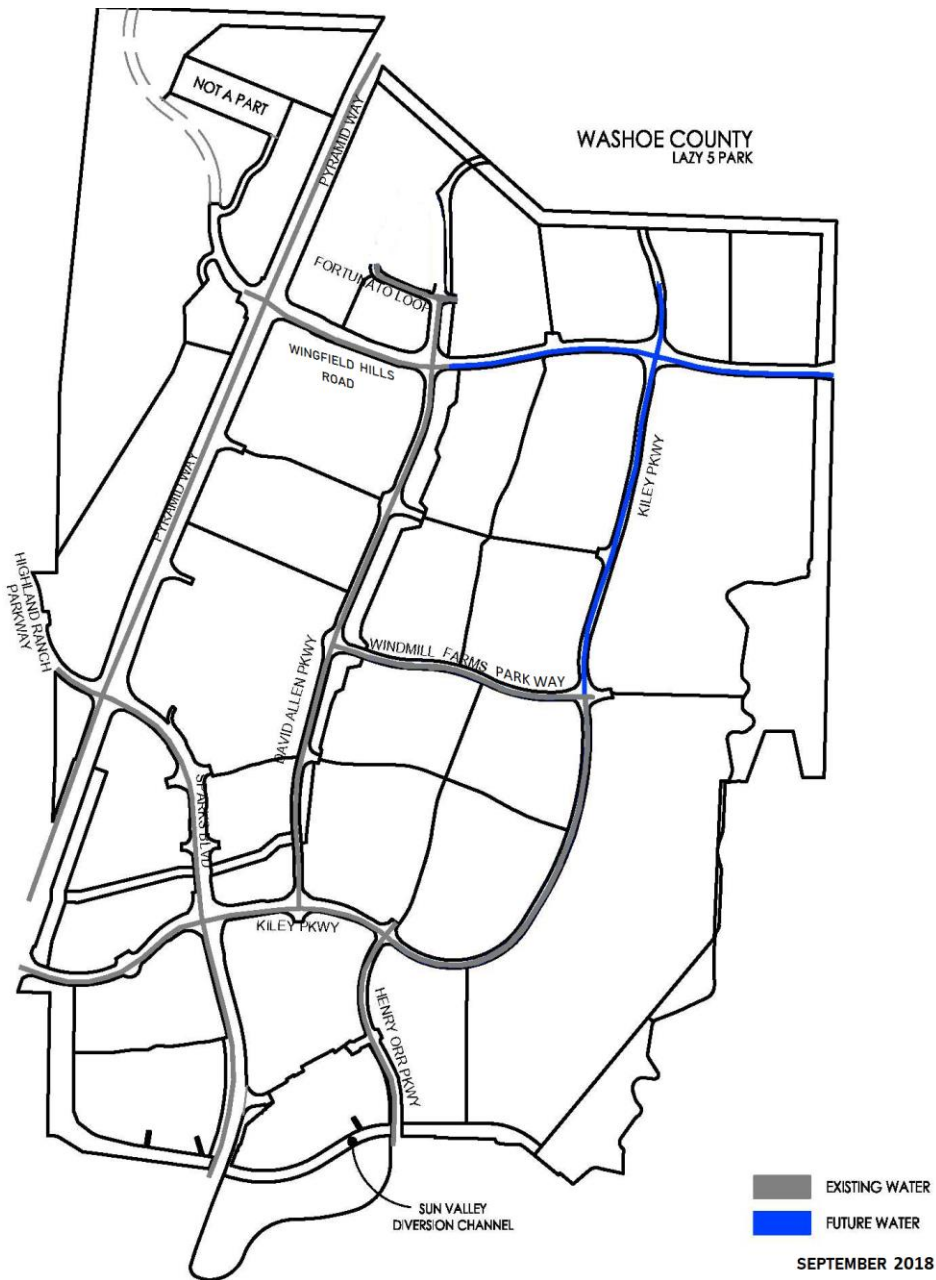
Existing and Proposed Potable Water Facilities
